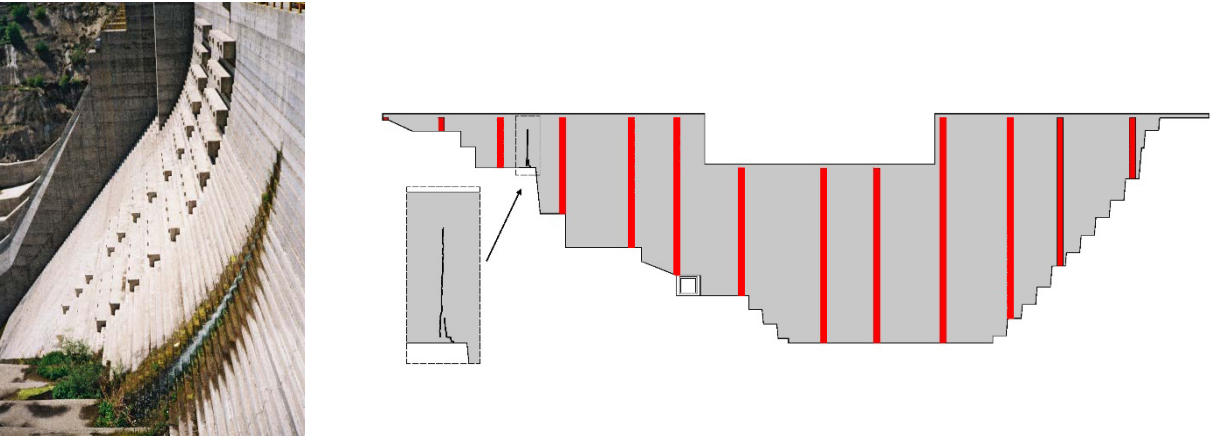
(Left) Leakage through to the downstream face of Platanovryssi dam, due to a crack that formed on the left abutment. (Right) Layout of the upstream face of the dam: the vertical lines indicate the contraction joints sealed with a Carpi external waterstop system in 1998. The insert indicates location of the crack that developed in one of the monoliths on the left abutment.
